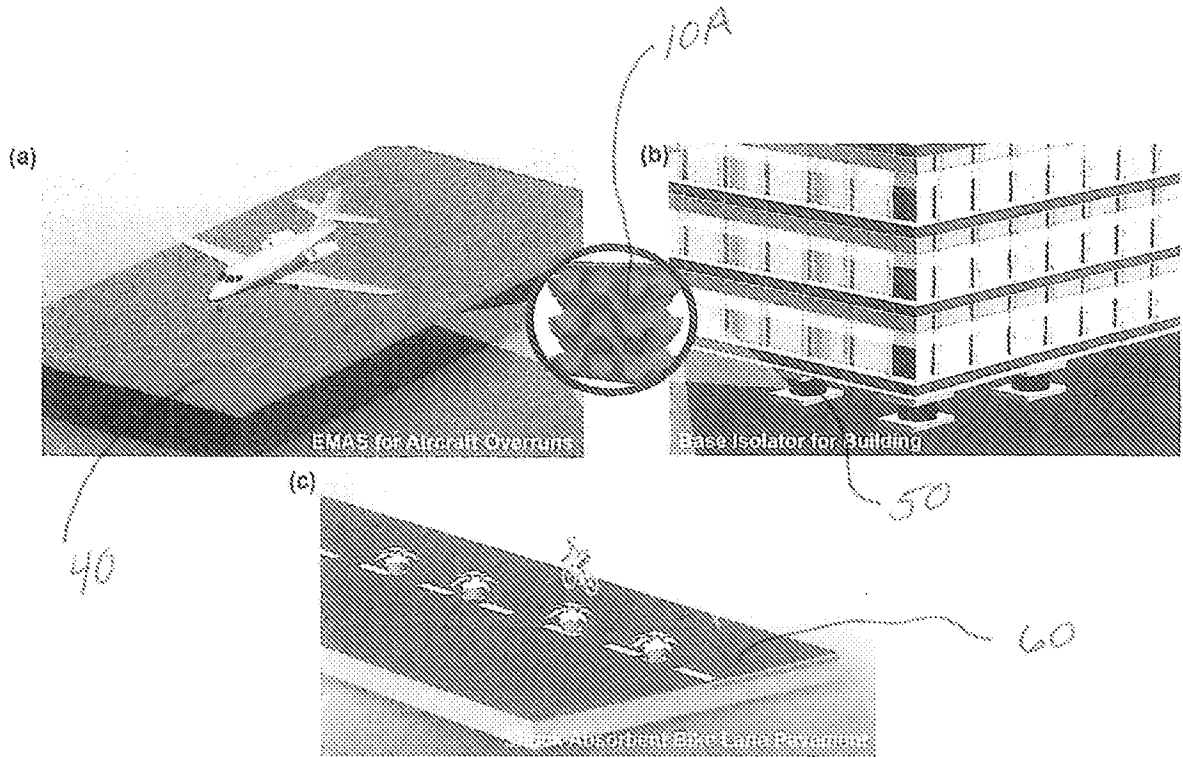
Unit slab concept design for the 3x3 metamaterial polymer formwork. Potential applications of the proposed metamaterial concrete: (a) A high energy absorbing engineered materials arresting system, (b) Metamaterial concrete base isolation system, (c) A shock absorbent bike lane pavement.
